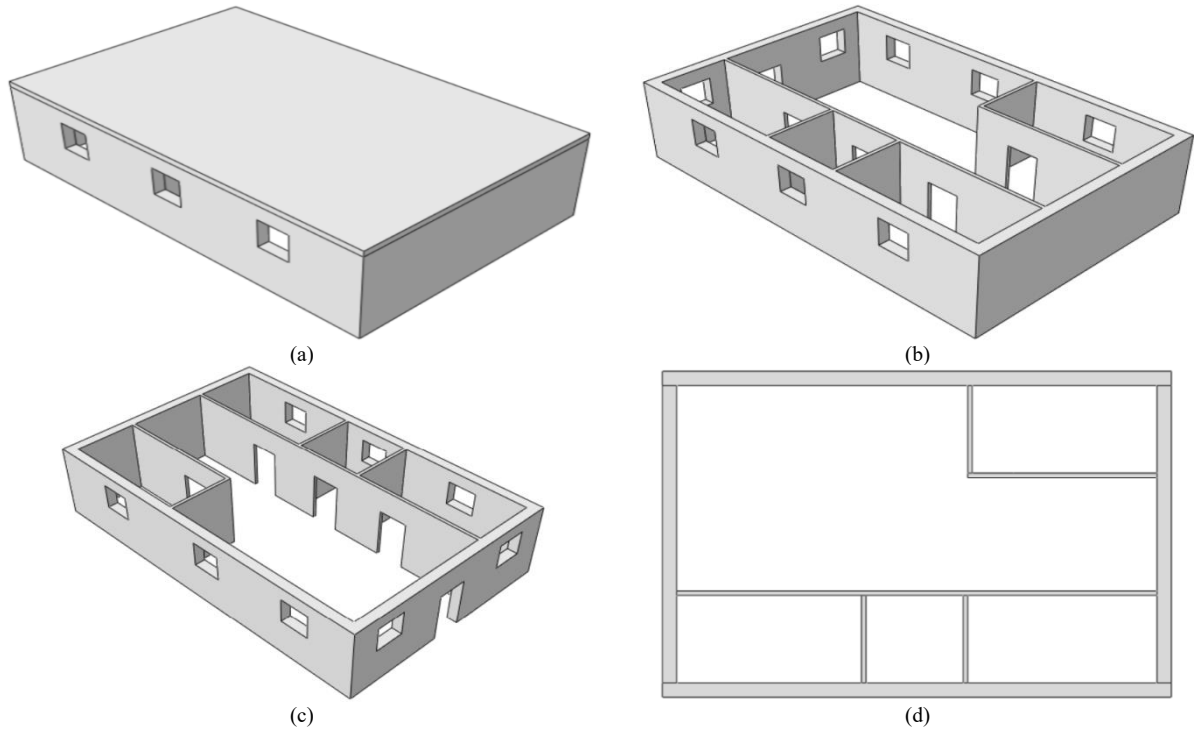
The 3D masonry building, (a) 3D view with roof, (b) 3D view without the roof, (c) 3D view without the roof (Another view), (d) Plan
